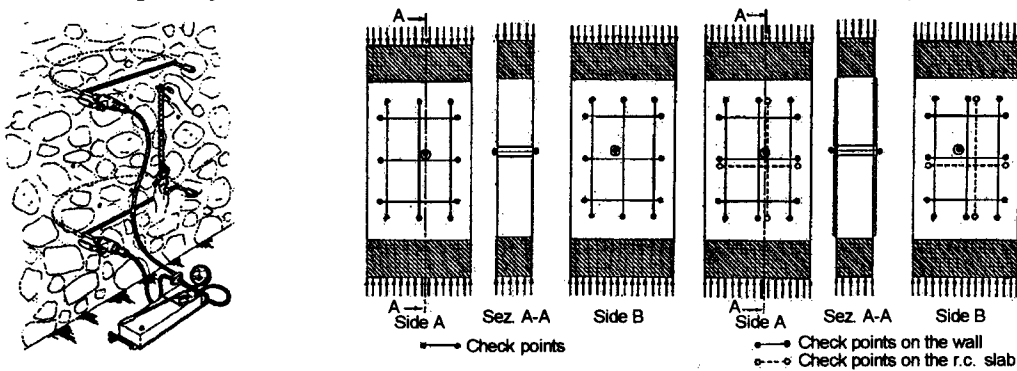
Flat jack test scheme Figure 2: Compression test for original and reinforced walls.
